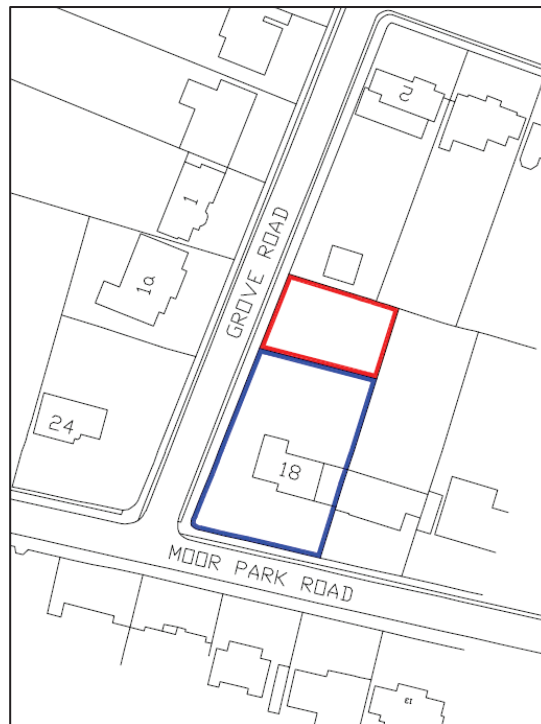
Aerial View of the application site in the context of the existing dwelling and the properties along Grove Road.
